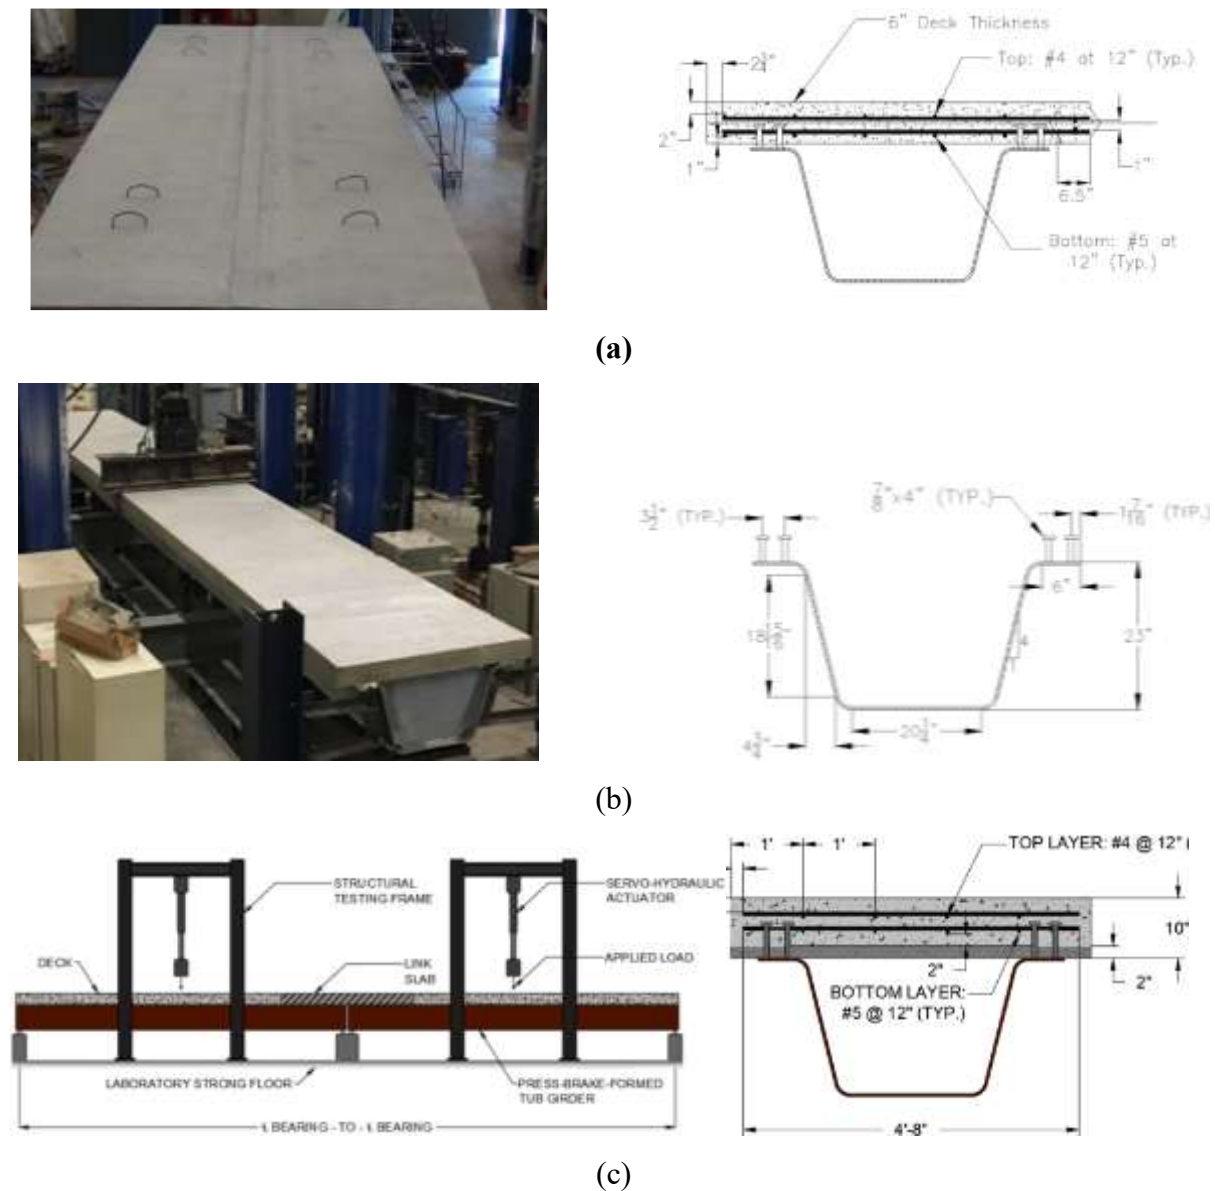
(a) Cold-Formed Tub Girder Modular Unit [16], (b) the ungalvanized and galvanized composite tub girders [3], (c) cross-section of the composite bridge girder [17].
